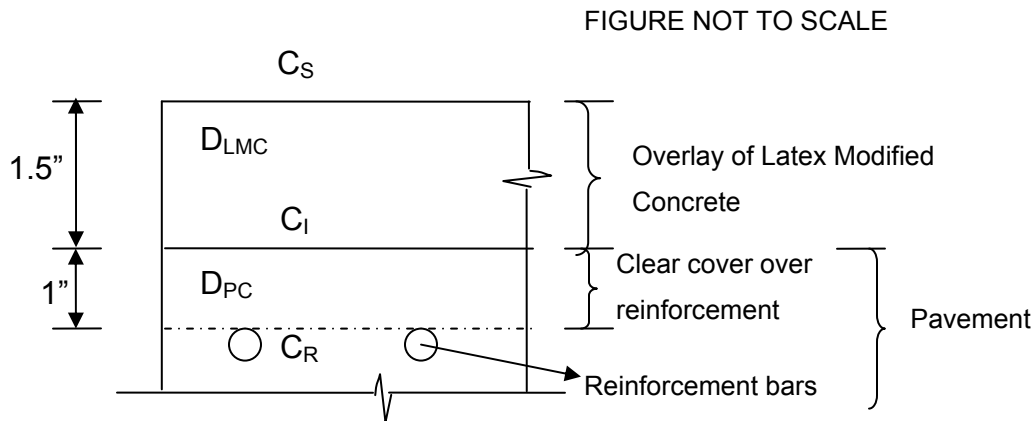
The details of bridge deck where LMC overlay is used [INDOT].
